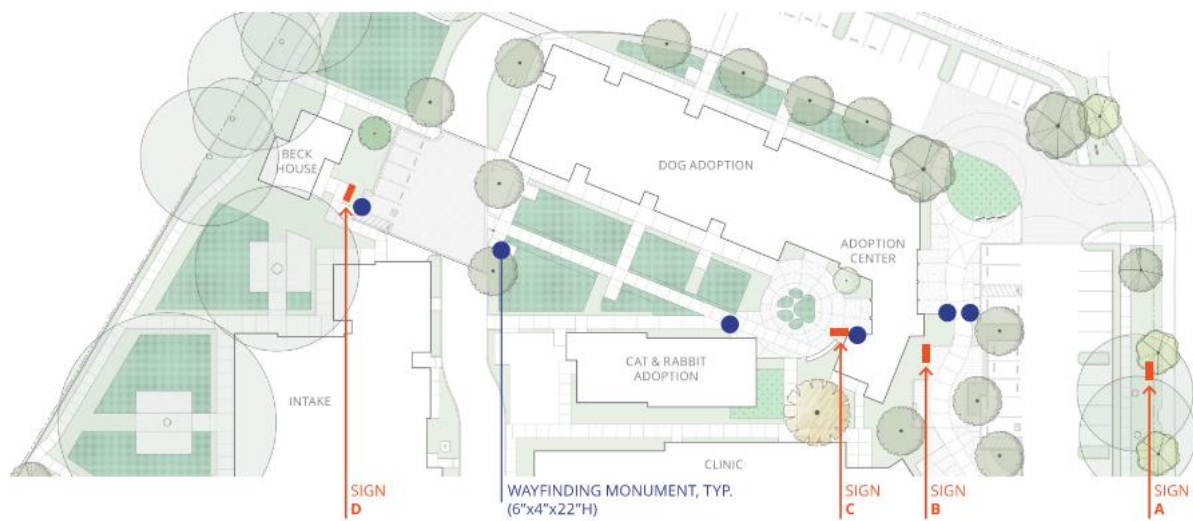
Approved Site Plan with New Location of Beck House (Letter H)
